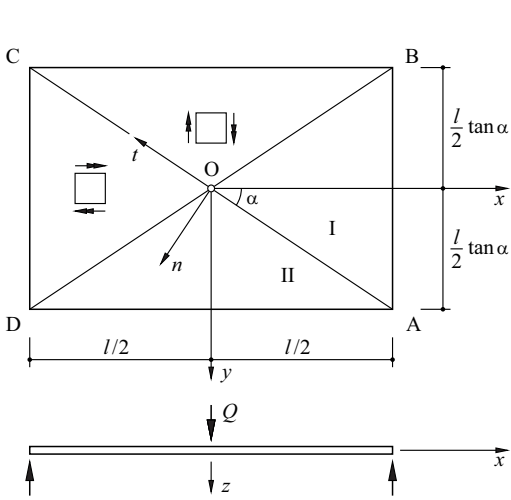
Rectangular slab supported at the corners and subjected to a central point load
